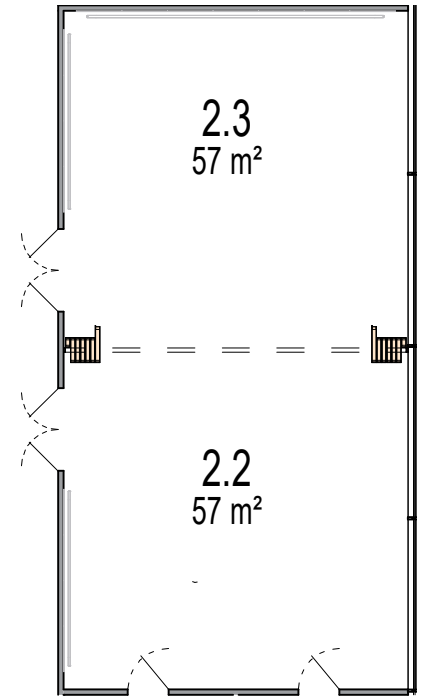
Flexible dance halls with open moveable walls-floorplan
